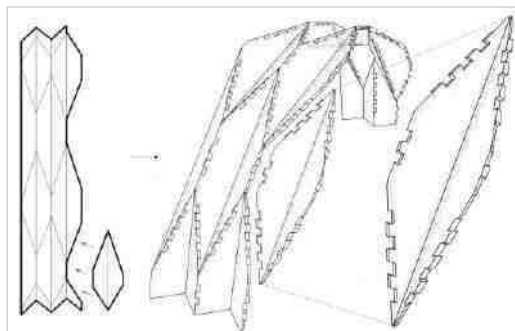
Example of folded plate structures. The Figure shows a folded plate structure with dovetail joints, which does not use additional fasteners, as developed by Robeller et al., as noted by Weinand [5].
